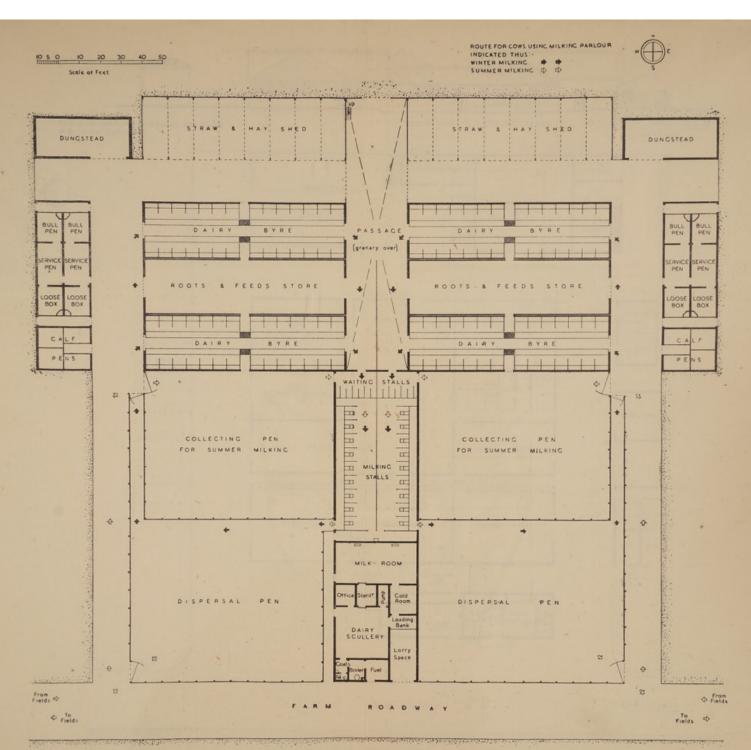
Plan J. Dairy Steading for 224 Cows (See paragraph 59)
